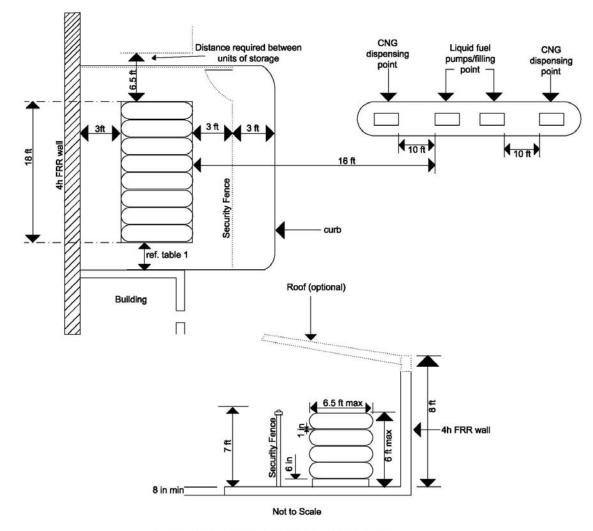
Typical or specimen layout of horizontal cylinder CNG storage units: Safety distances in a public refueling station
